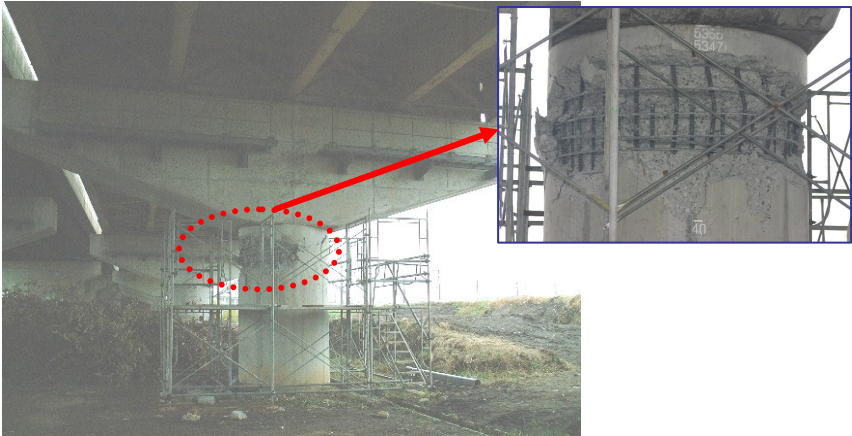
One of the damaged pier columns of the railway overbridge in Ojiya
